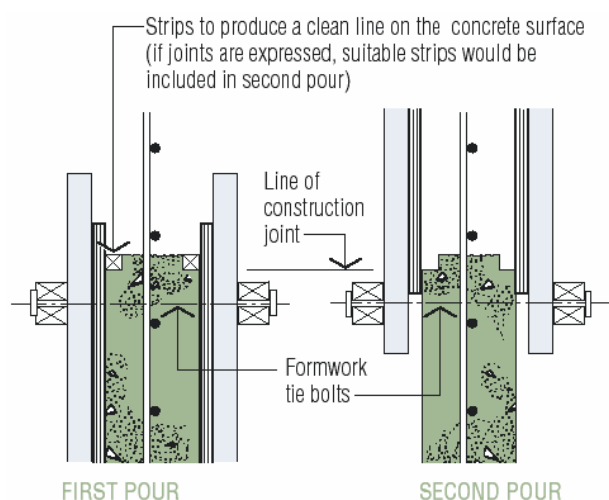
Horizontal construction joint in wall when a clean, neat line is needed
